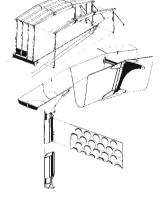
Details of loadbearing construction Jean Prouvé: Pavillon du centenaire de l'aluminium, Paris (F), 1954
